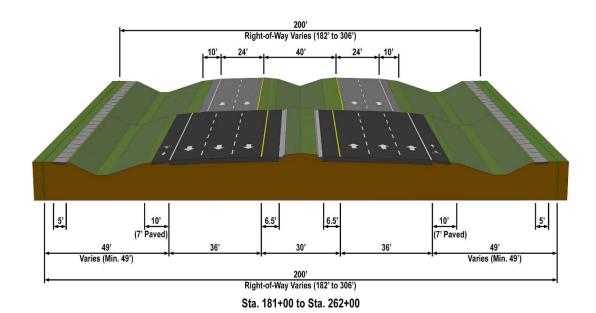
Suburban Typical Section – Alternatives 1 & 2
